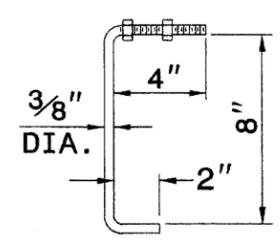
DETAIL SHOWING ANCHORAGE OF FRAME FOR GRATED DROP INLET
